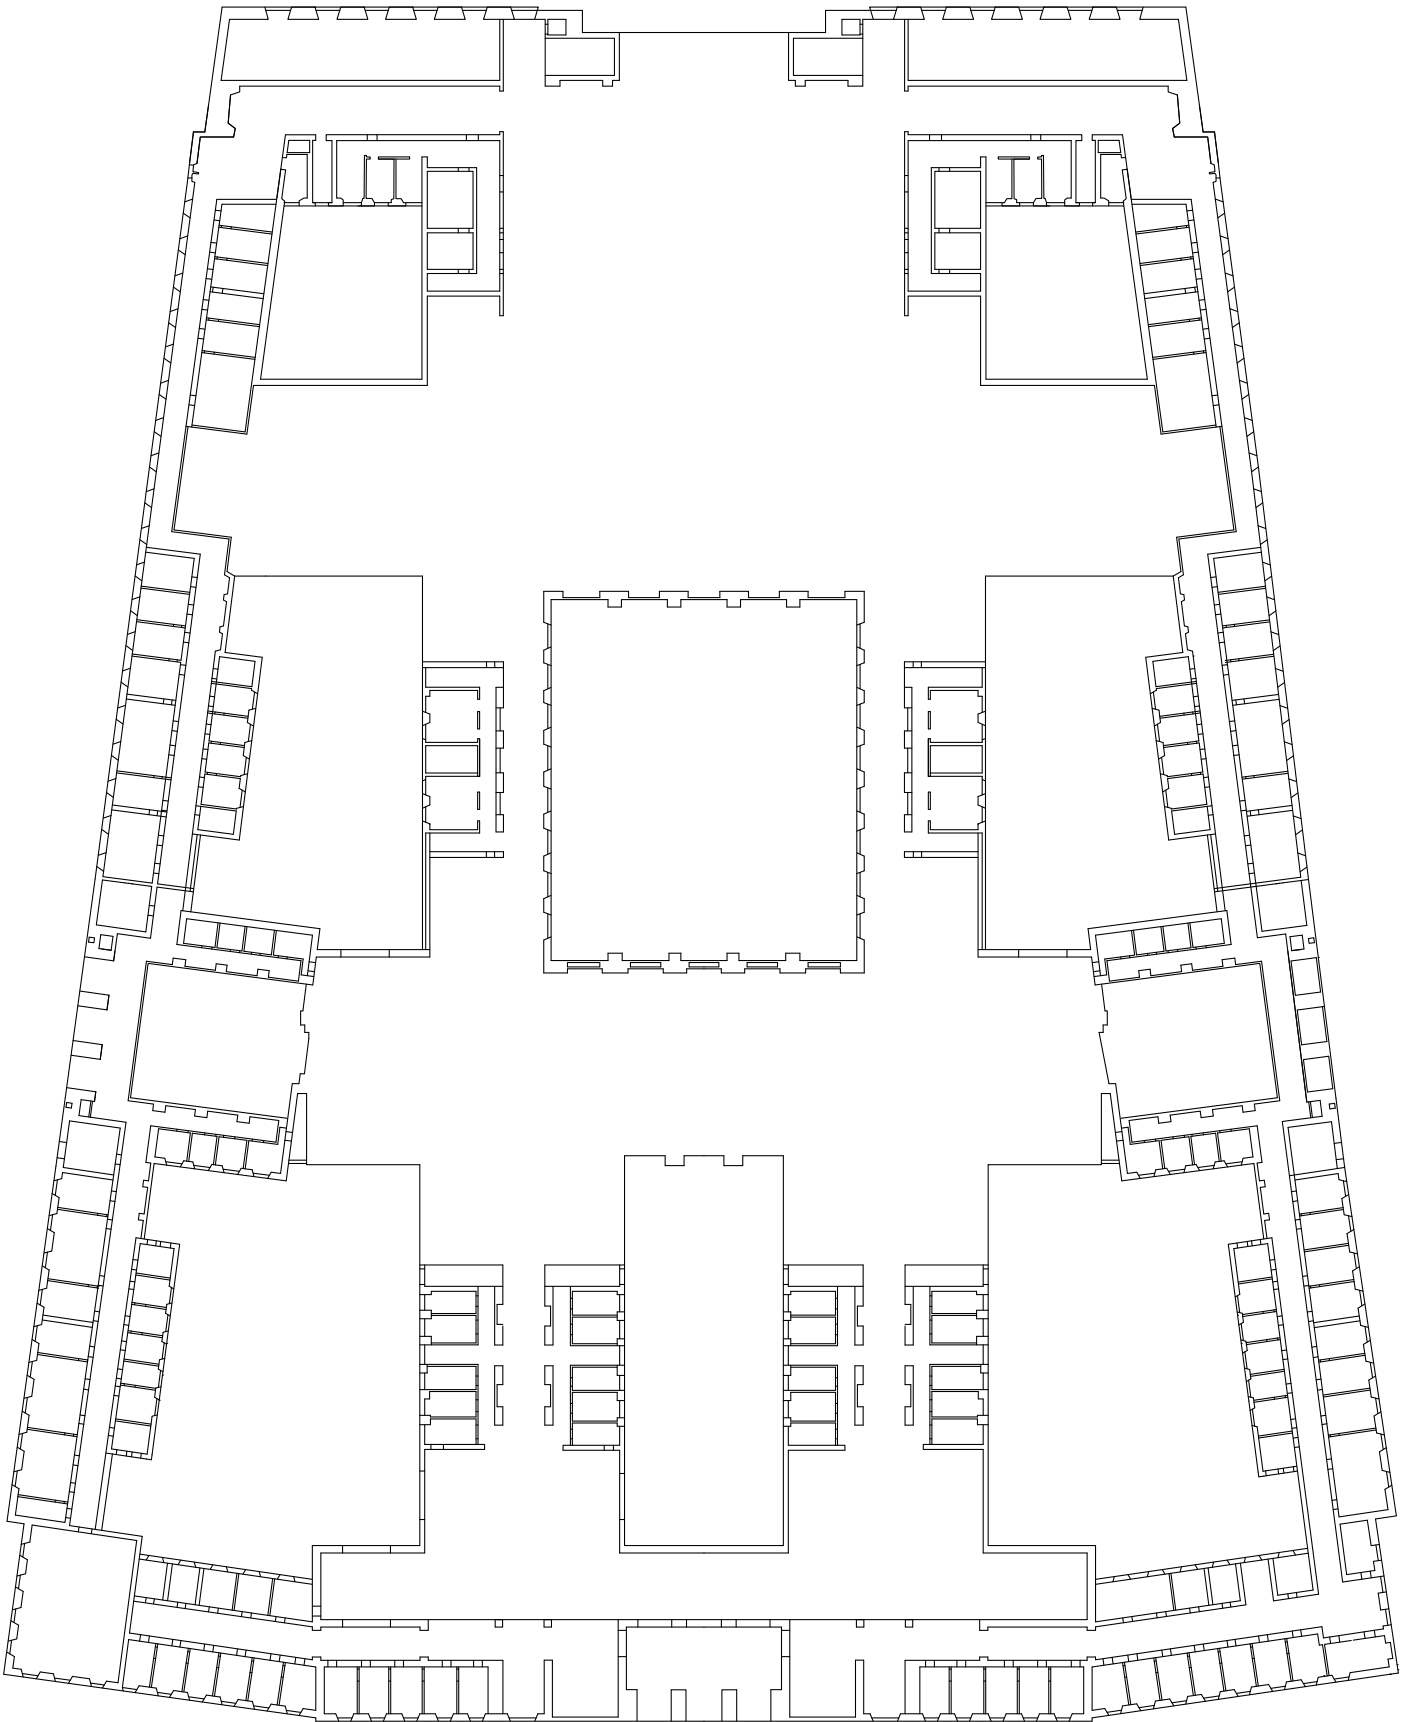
First Floor Mezzanine Plan, extending only partially on the surface of the raised floor.
